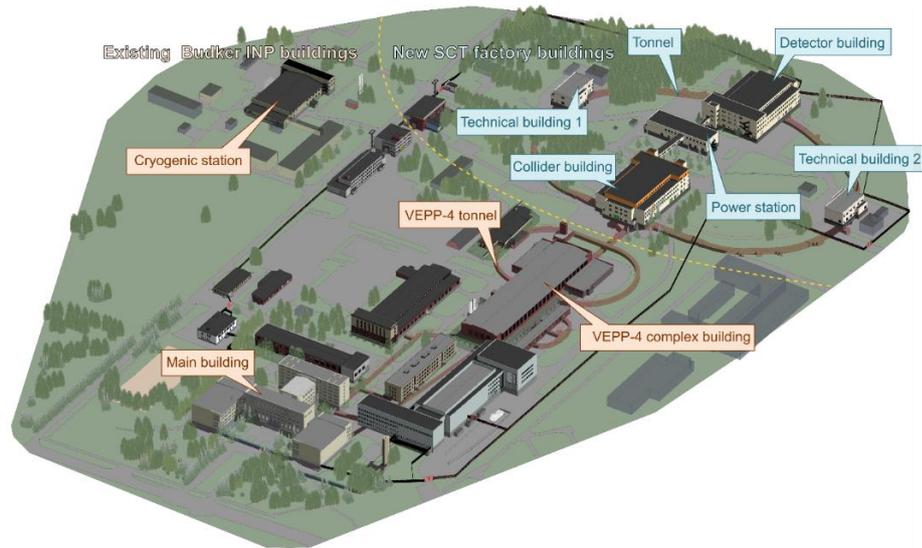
Existing and new buildings and underground tunnels for the SCT accelerator complex.
